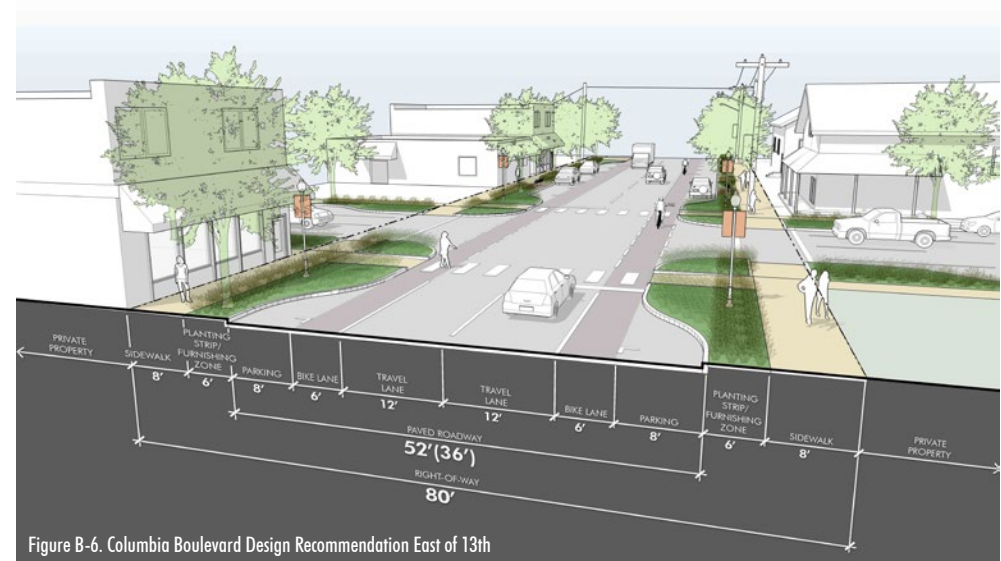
Columbia Boulevard Design Recommendation East of 13th
